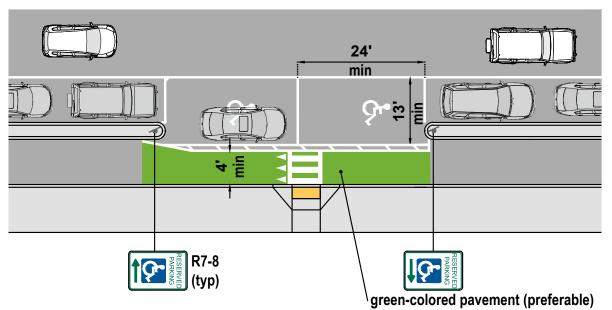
Accessible parking design adjacent separated bike lane at crosswalk location
